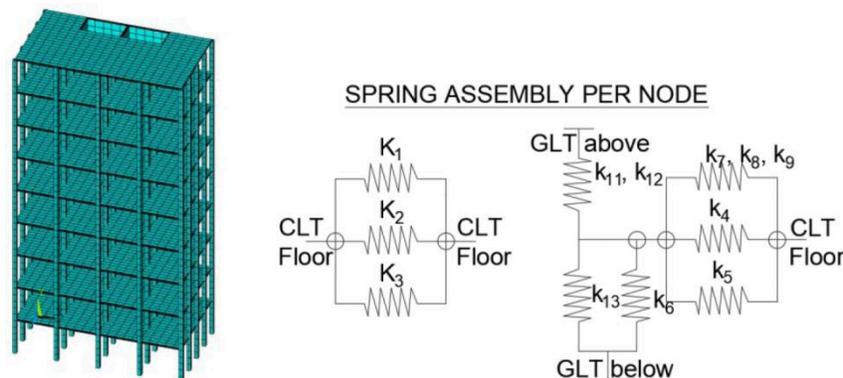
FE model of the 12-storey building (left), floor-to-floor connection (Centre), and column-to-column and floor to column connection (right)
